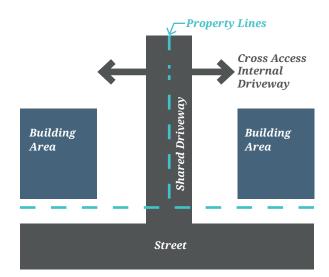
Shared Access Driveway & Cross Access Internal Driveway
